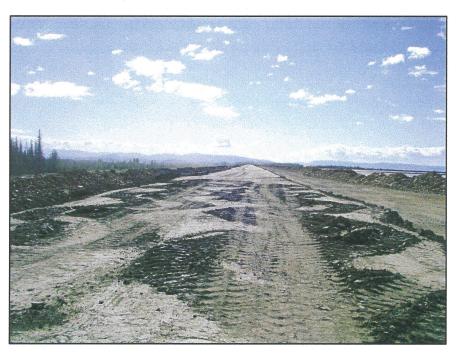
Comleted sand cell on the Perimeter Embankment.
